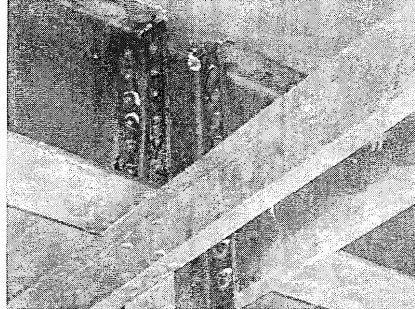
Signs of distress at girder-column joint (Photo: Goel).
